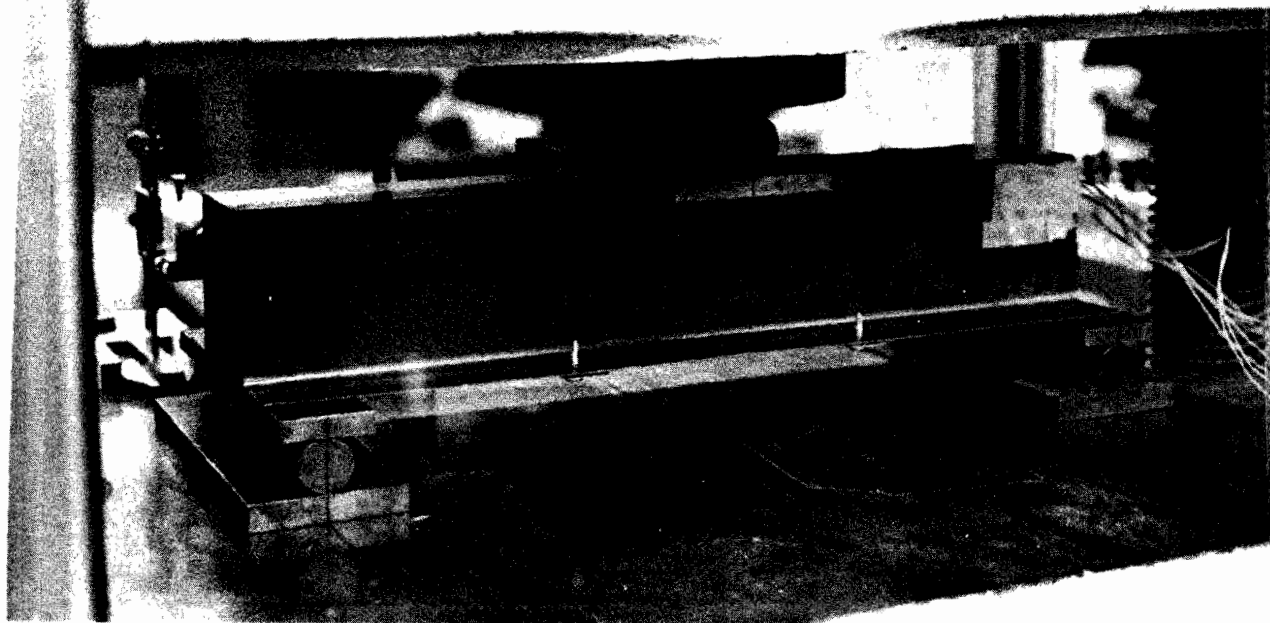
Photograph of Test Setup for End One-Flange
